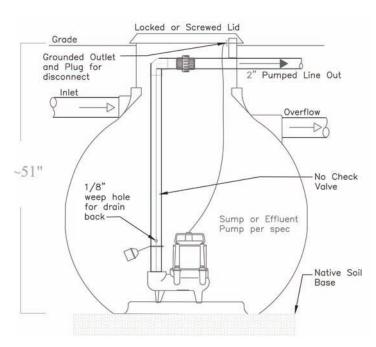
A pump tank can be used to pump water into a system's main water storage tank.
